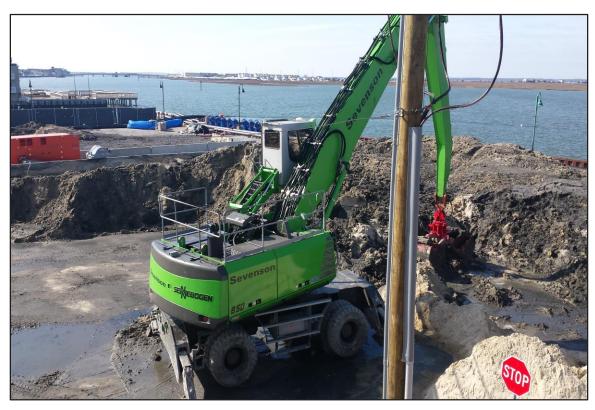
De-watering Area – Sand for blending, mixing boxes, sump pump on standby. (Looking west)
